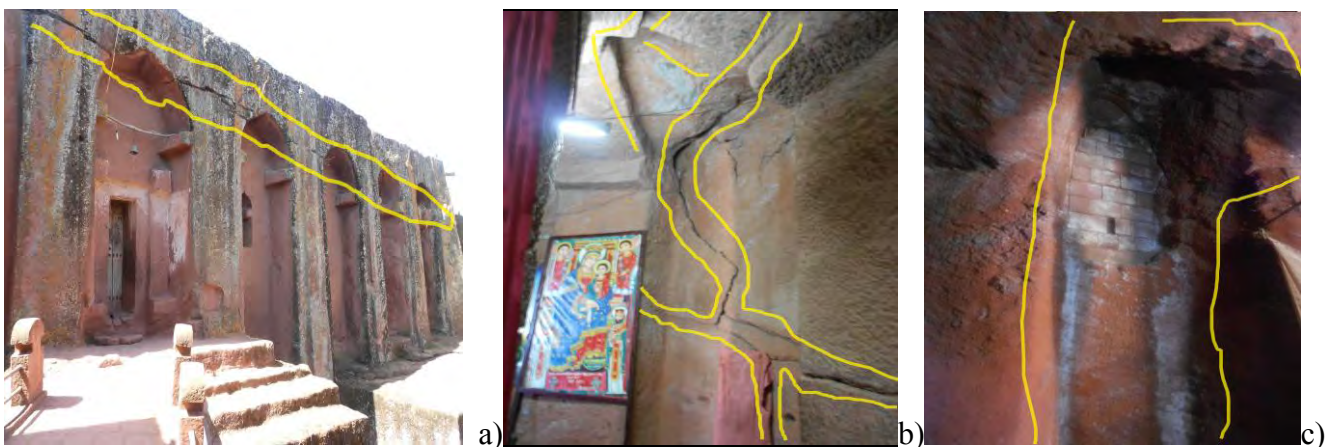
The Pattern of cracks at Bete Gebriel we Rufael a) The external eastern façade of the curche shows the most seveour longitudinal crack b) the internal branched crack jointly on the wall and roof c) highly deteriorated part of the internal wall and formation of efflorescence.
